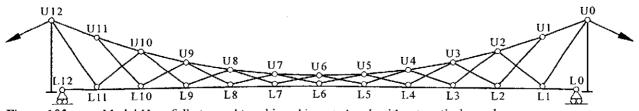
Model H — fully trussed two-hinged inverted arch without vertical members...
